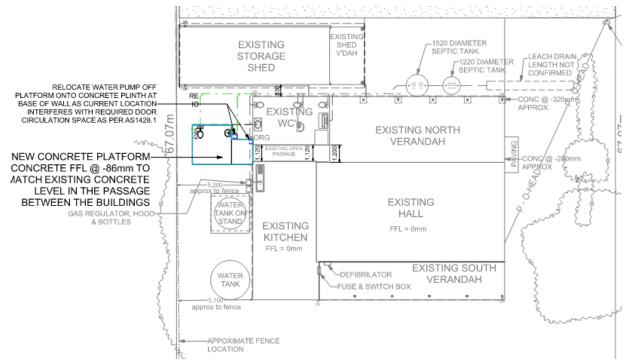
Site plan showing extent of proposed works with reference to existing features
